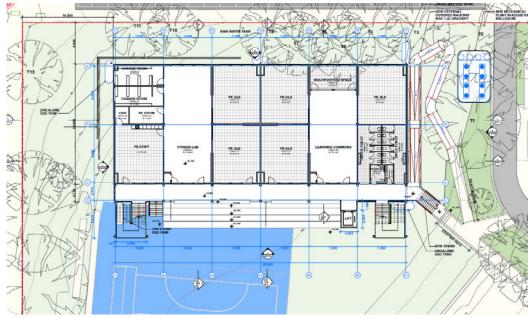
Proposed ground floor layout. Source: Bennett and Trimble. 2022
